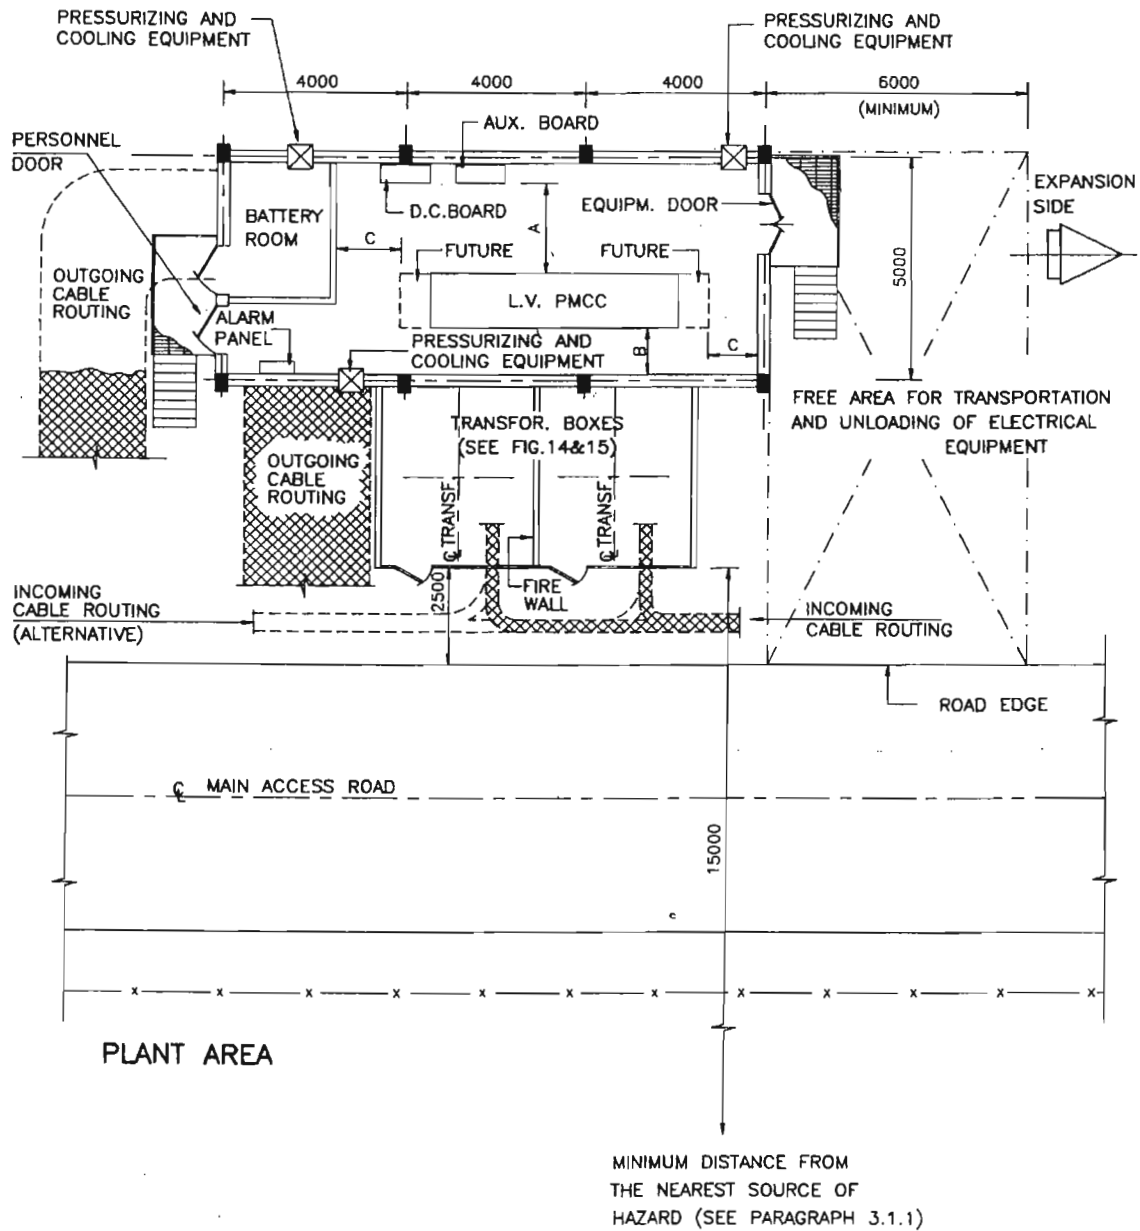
LAYOUT–L.V. SINGLE ENDED SUBSTATION
